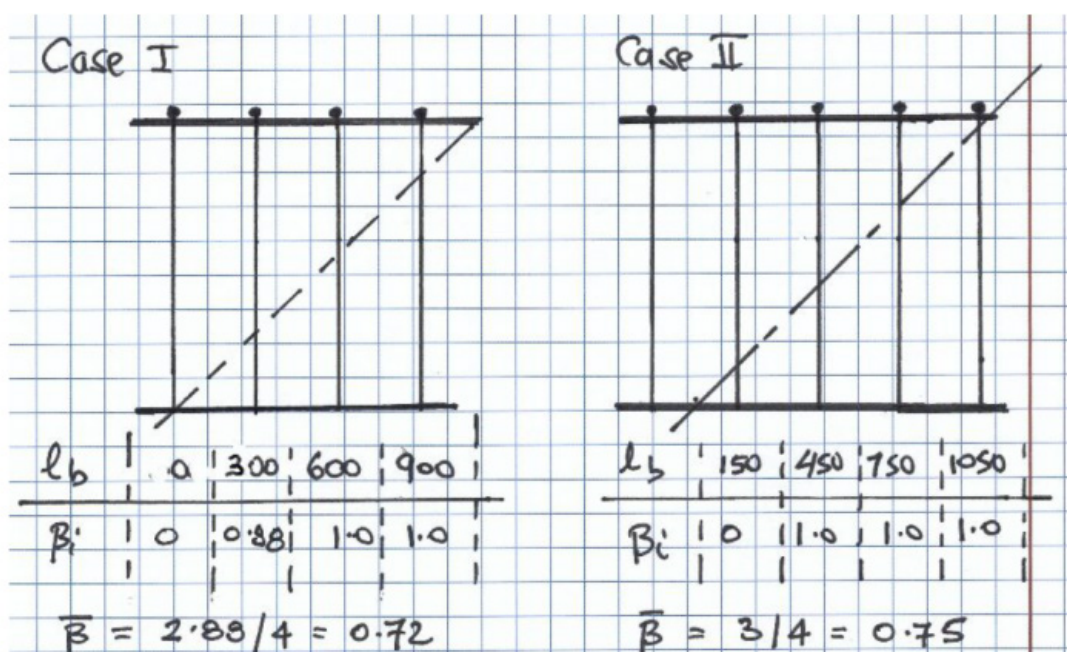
Anchorage of bars passing through diagonal shear crack.
